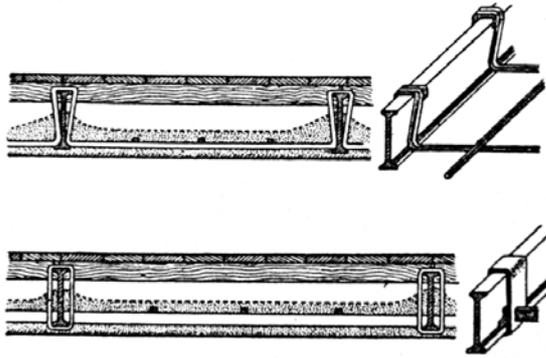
French method of constructing iron floors, 1840s. (Hamilton)
